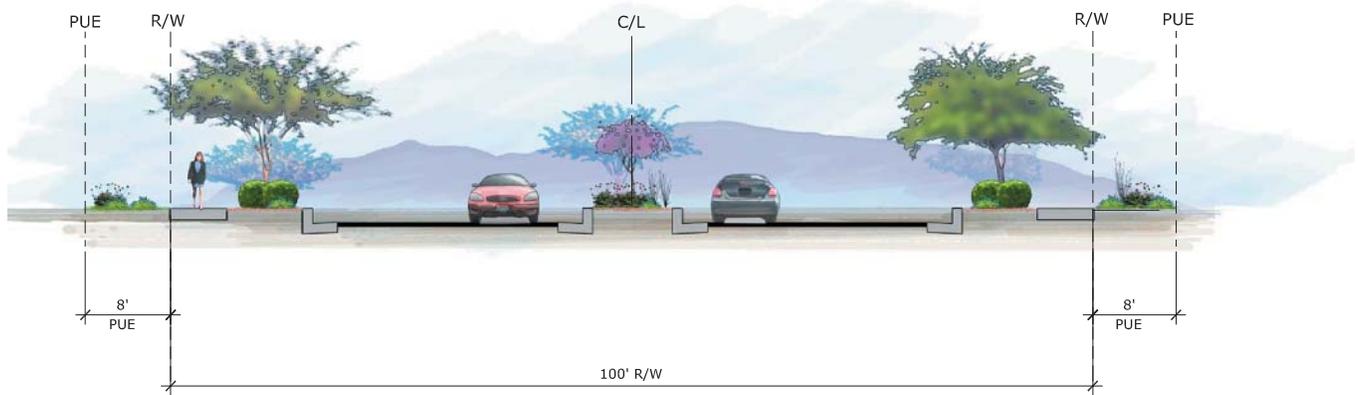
Arterial Street Cross-section and Conceptual Streetscape
